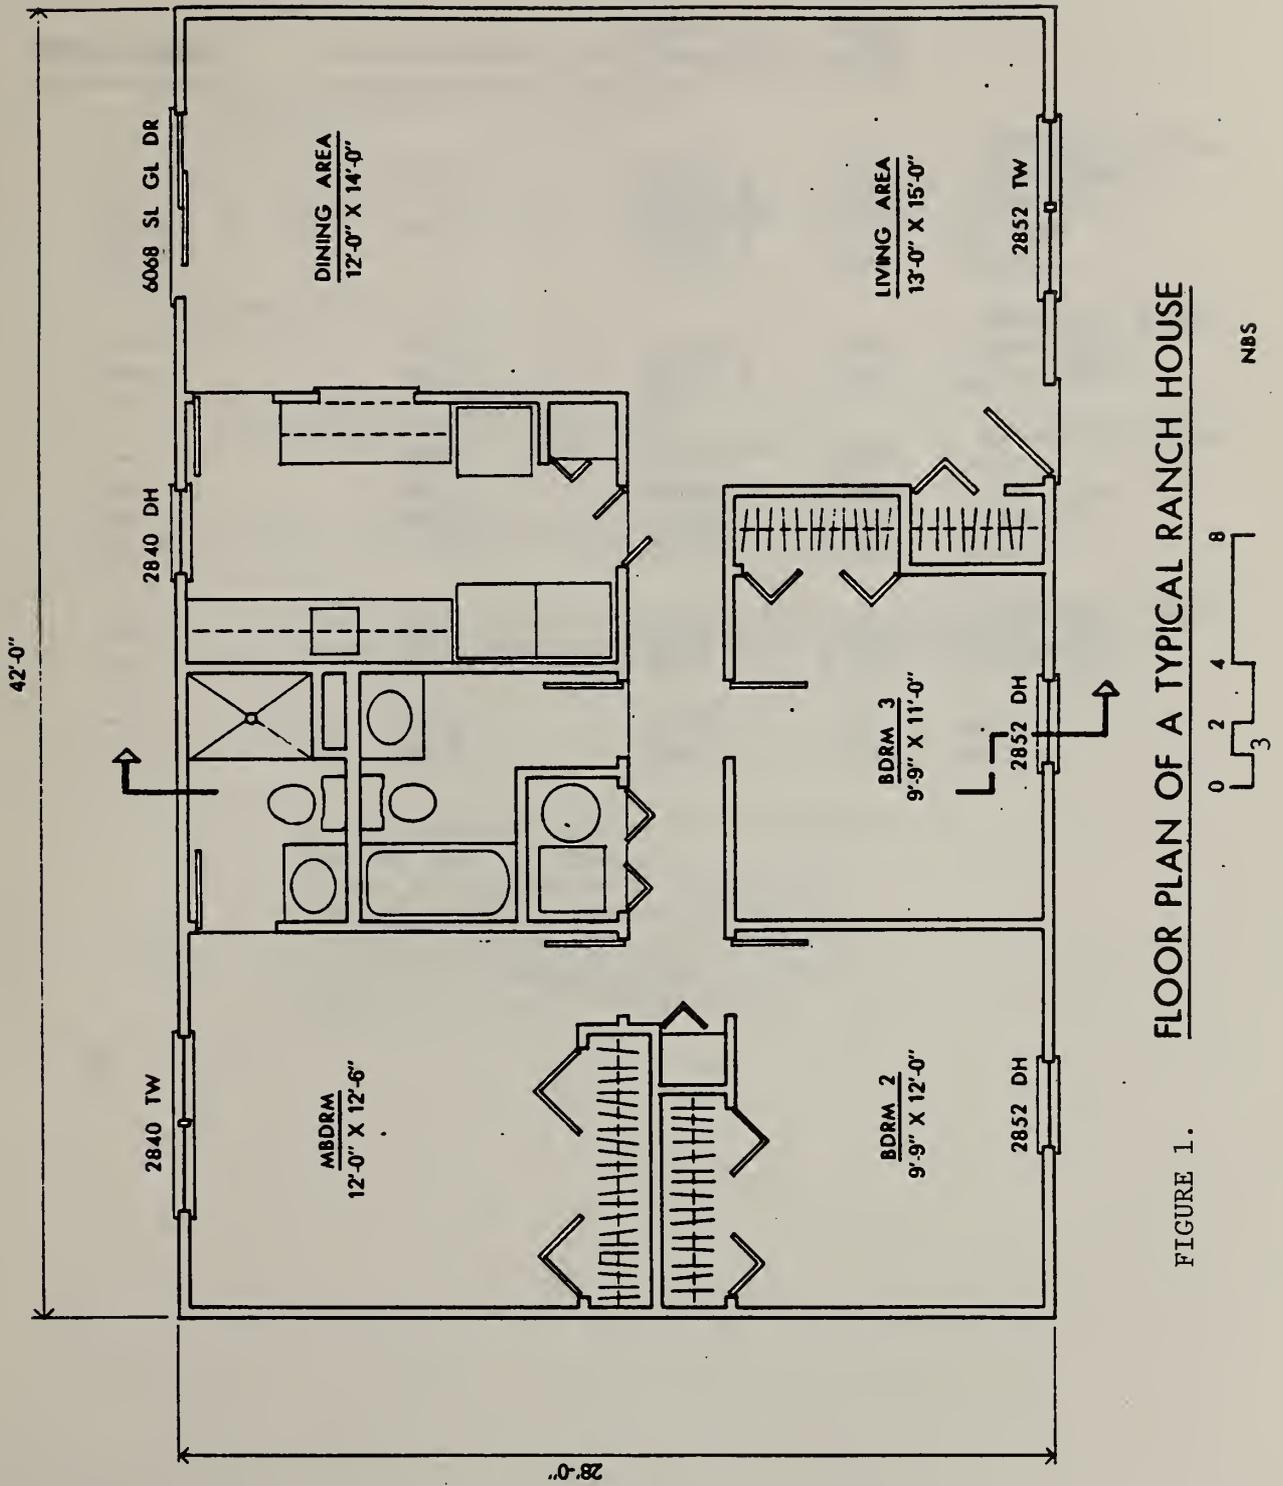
FLOOR PLAN OF A TYPICAL RANCH HOUSE
